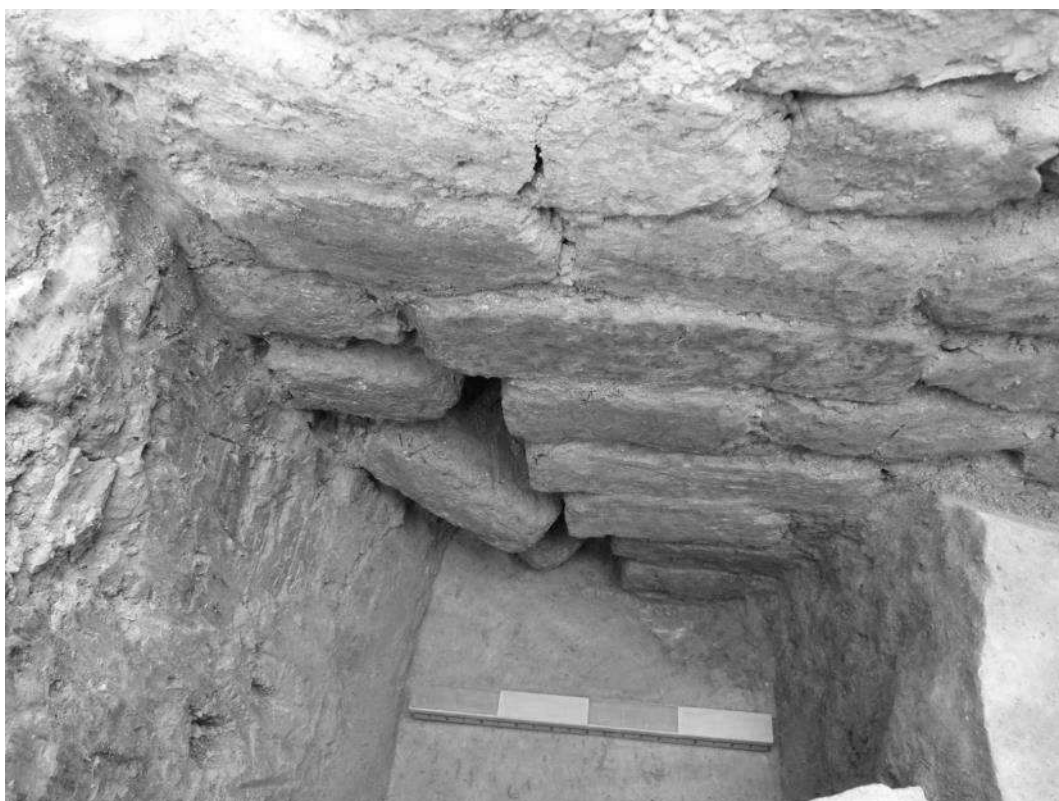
Shear crack of wall within Trench 1 indicating possible earthquake damage.
